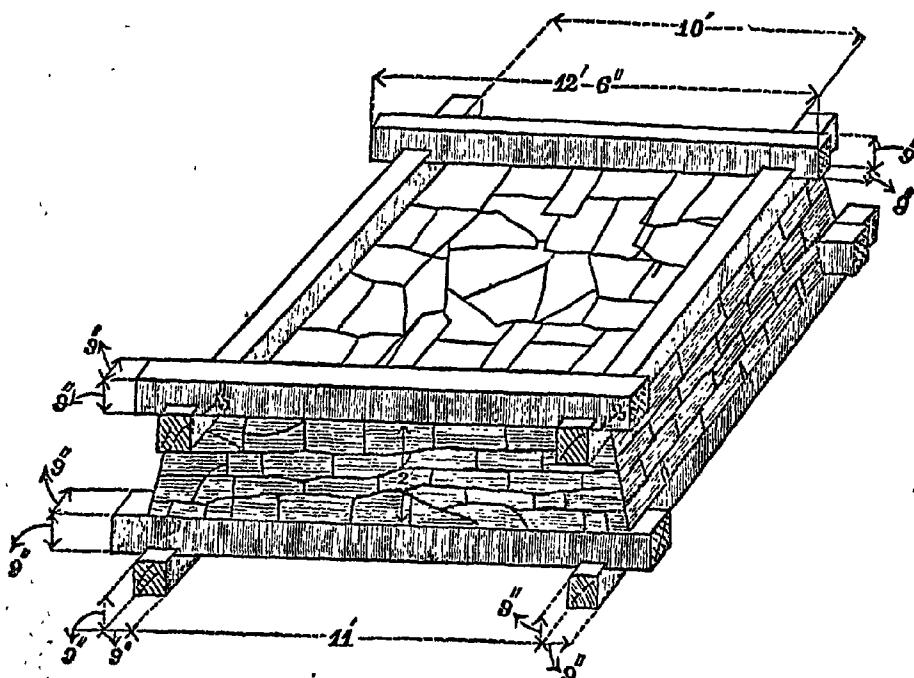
is a dimensioned sketch of part of a pier of a bridge on the Bamsu sledge road, showing how piers of dry rubble may be bound together by beams of wood. The wooden beams used are 9 inches square, and their lengths vary with the size of the pier. The sides of the pier are given an inclination to the vertical or batter of 1 in 4. The beams are notched about 3 inches into each other.
